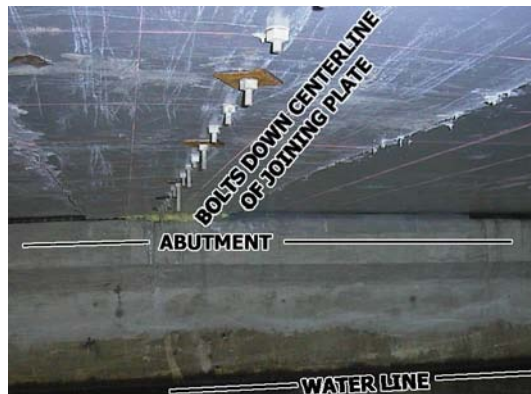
View of Underside of Composite Bridge Deck, Looking North with Centerline Joint
